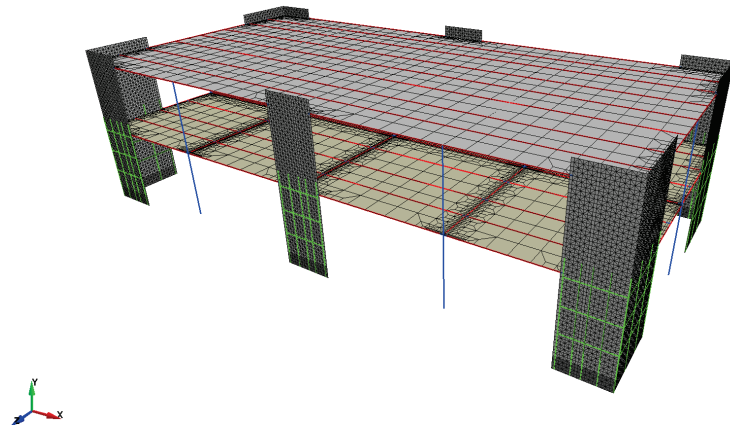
Refined finite-element model for a two-story reinforced masonry commercial building archetype.
